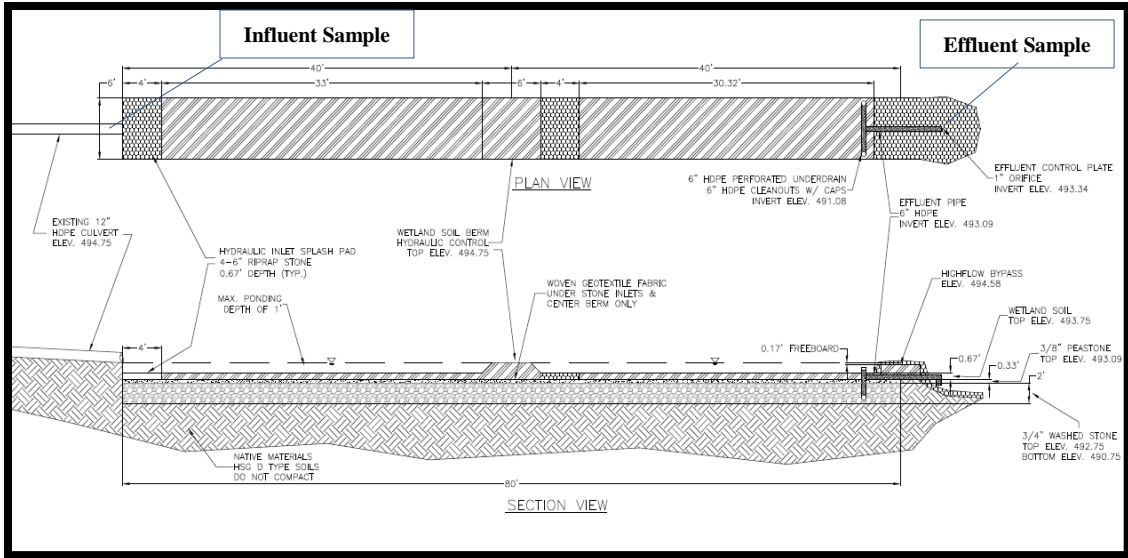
Plan and profile view of Oyster River Road SGWSC.
